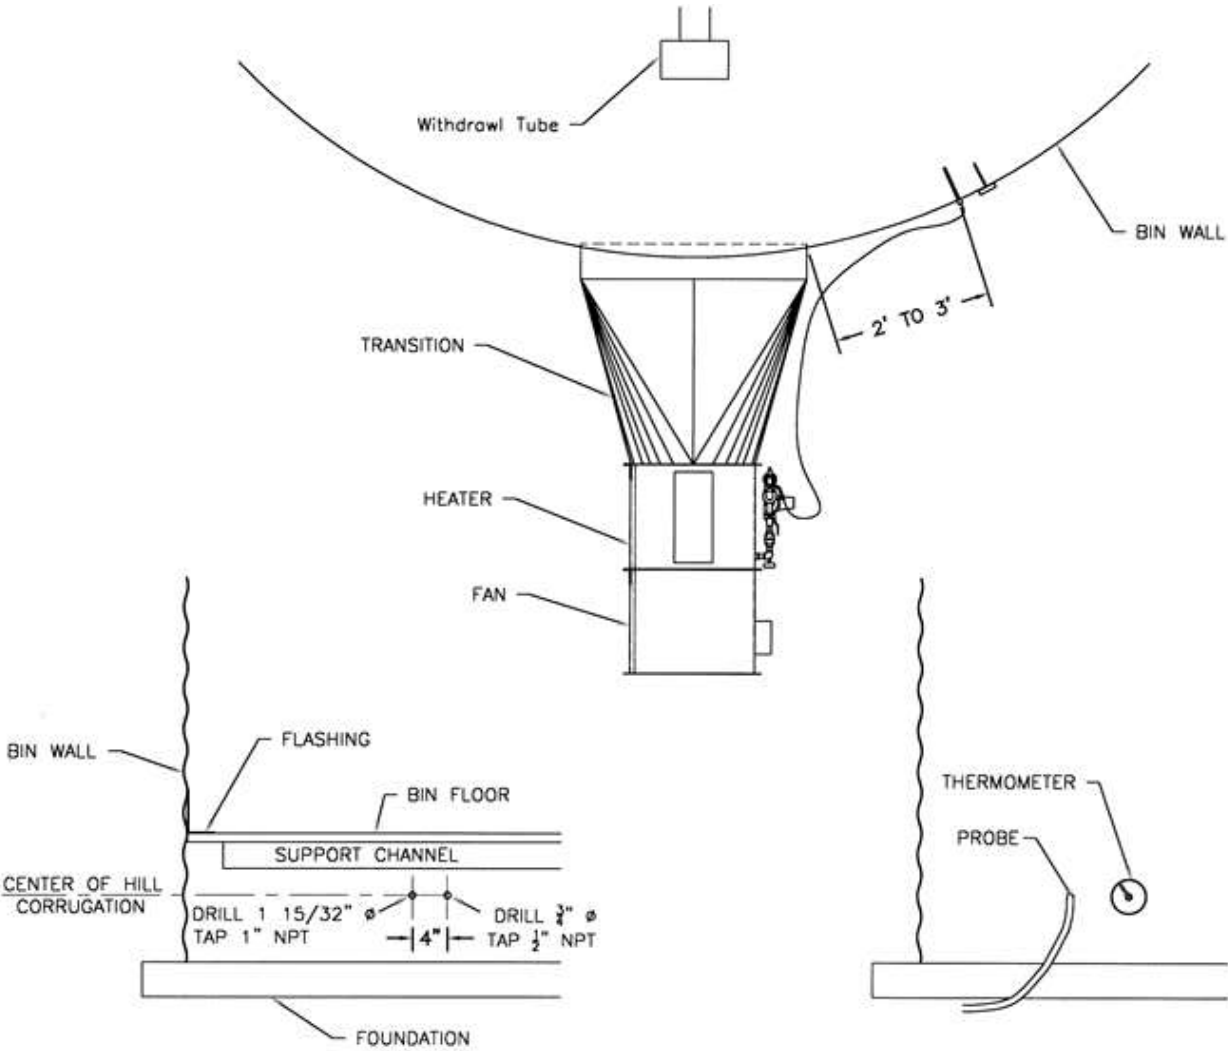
HEAT SENSOR AND THERMOMETER LOCATION FOR ONE HEATER WITH MODULATING VALVE
